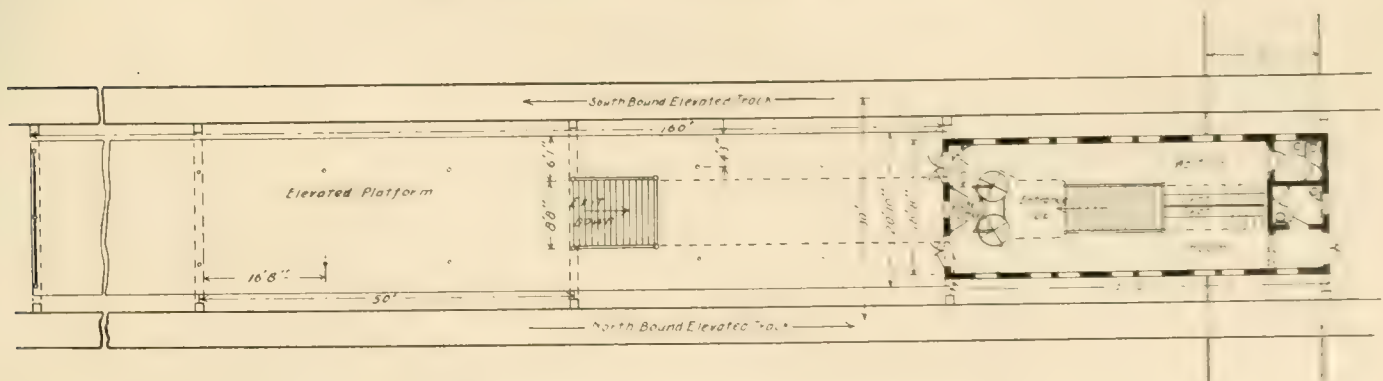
PLAN OF ATLANTIC AVE. ELEVATED STATION.
